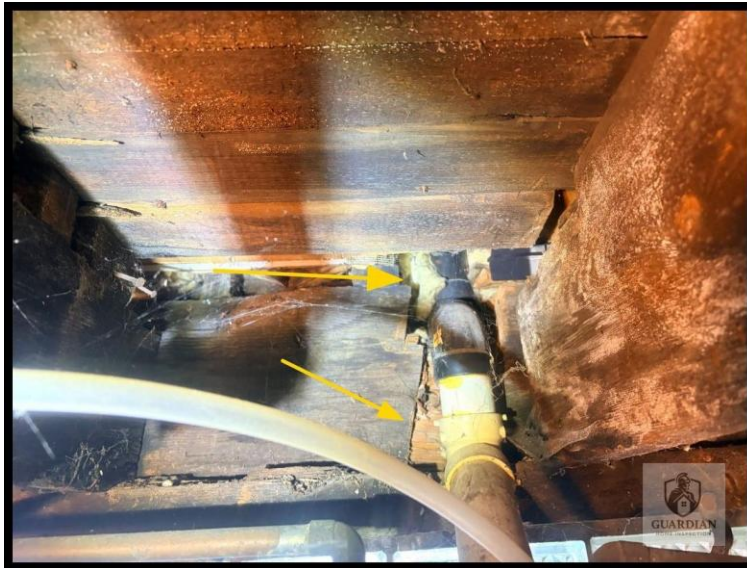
Over-notched and poorly constructed floor joists were observed in the basement.
